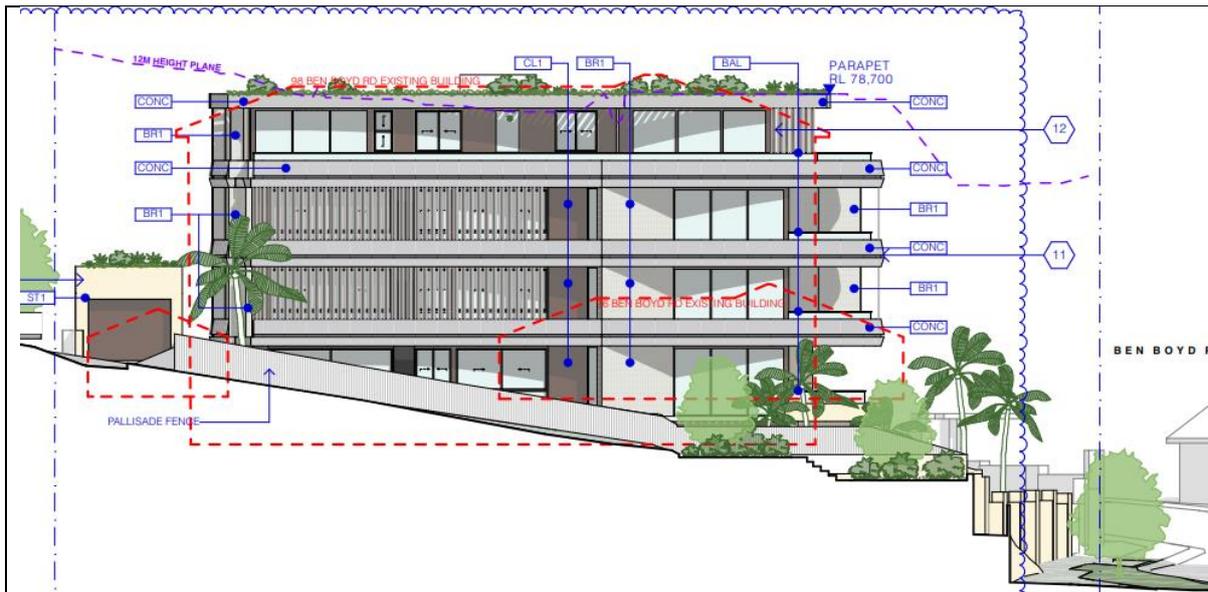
Approved Western Elevation, DA 3003 Rev C
